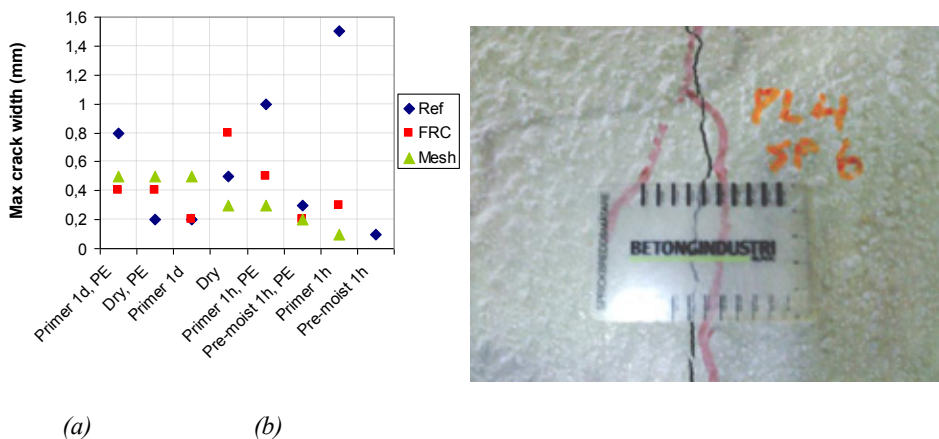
(a) Maximum crack widths measured at the end of the test period. (b) Photo showing the largest crack on slab 4 (ref).
